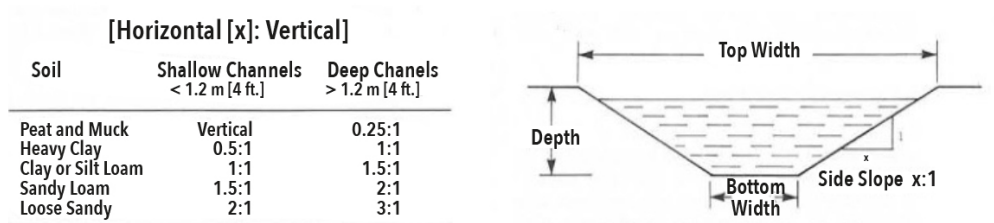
Recommended open ditch side slopes (left) and a typical open ditch cross section.
